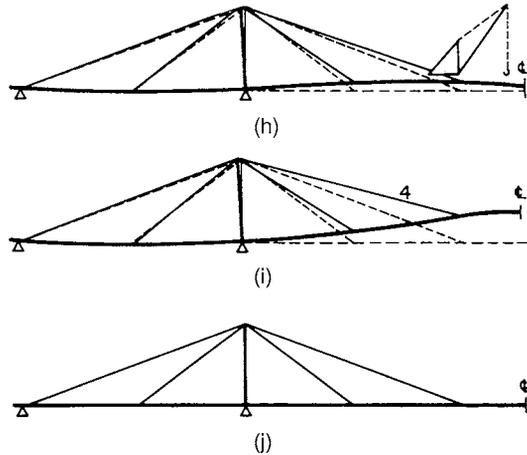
(Continued) (h) Girder is cantilevered to midspan and spliced to its other half. (i) Cable 4 is given its final stress. (j) The roadway is paved, and the bridge takes its final position. (Reprinted with permission from H. J. Ernst, "Montage Eines Seilverspannten Balkens im Grossbrückenbau," *Stahlbau*, vol. 25, no. 5, May 1956.)
